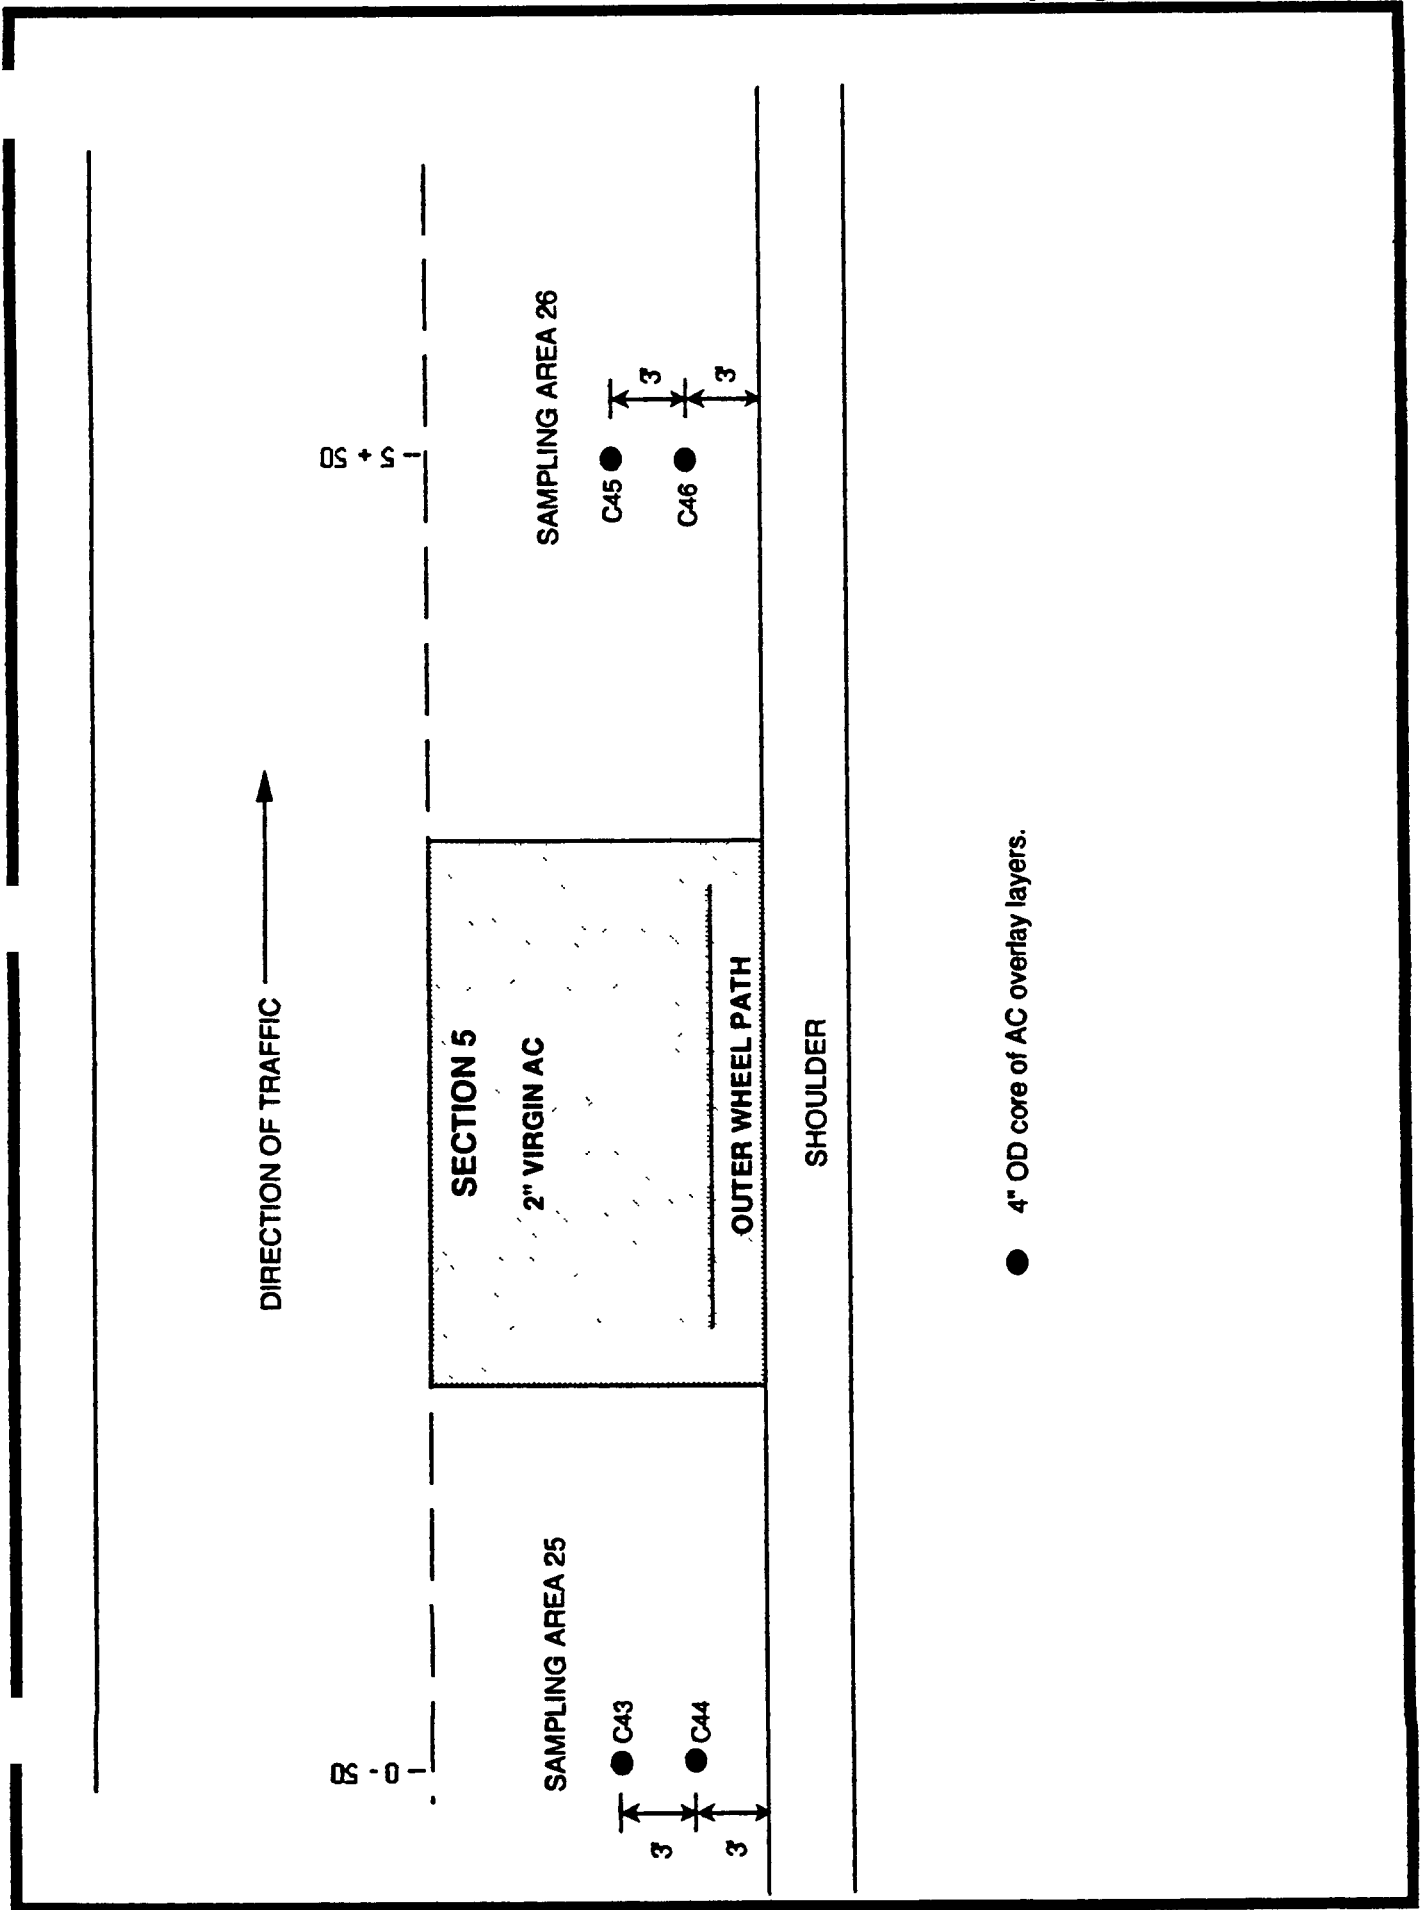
Example of 'Post-Construction' Sampling Plan for Section 5.
